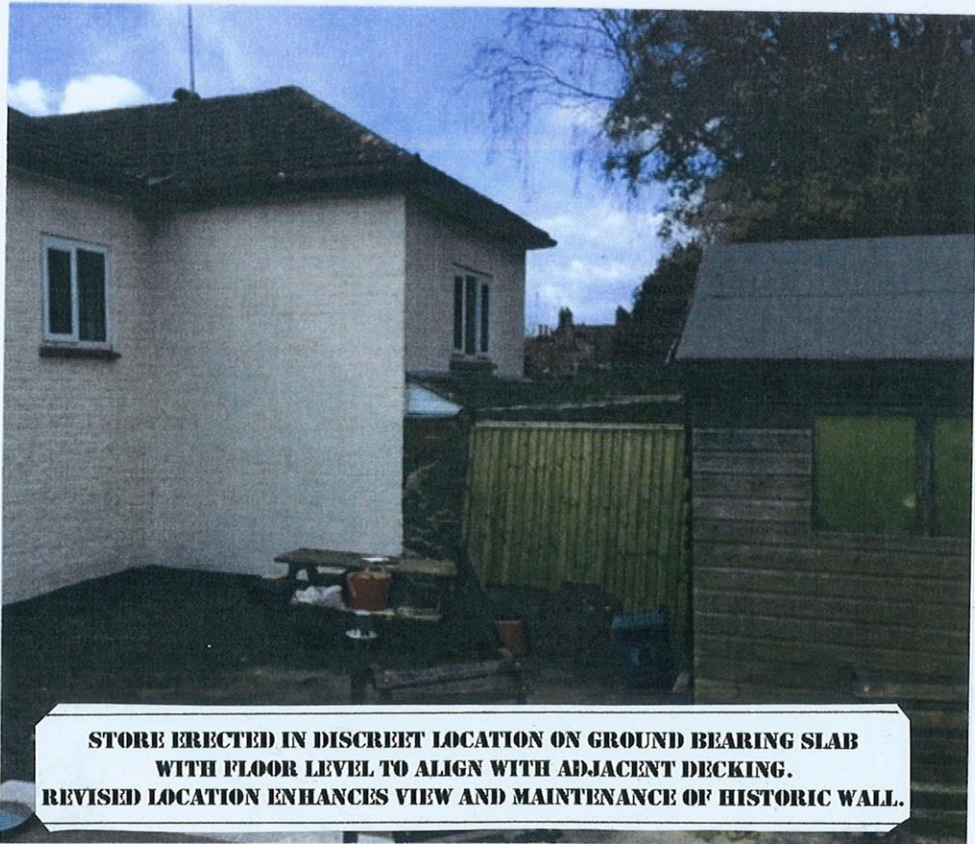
PHOTOS TO BE READ IN CONJUNCTION WITH DRAWING 03
